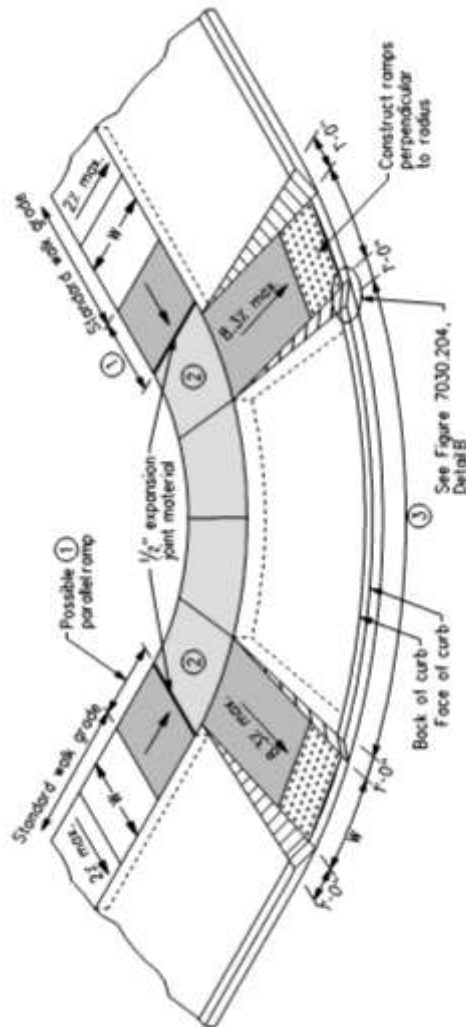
ALTERNATE CURB RAMPS WITHIN INTERSECTION RADIUS FOR CLASS B OR C SIDEWALK
